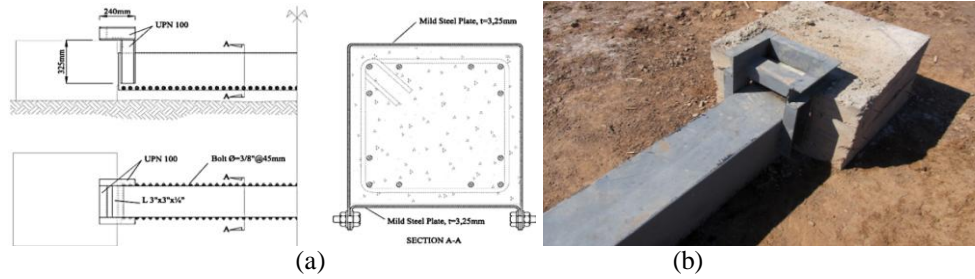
RC member retrofitted with steel jacket (a) concrete and steel jacket dimensions, (b) test setup¹²
